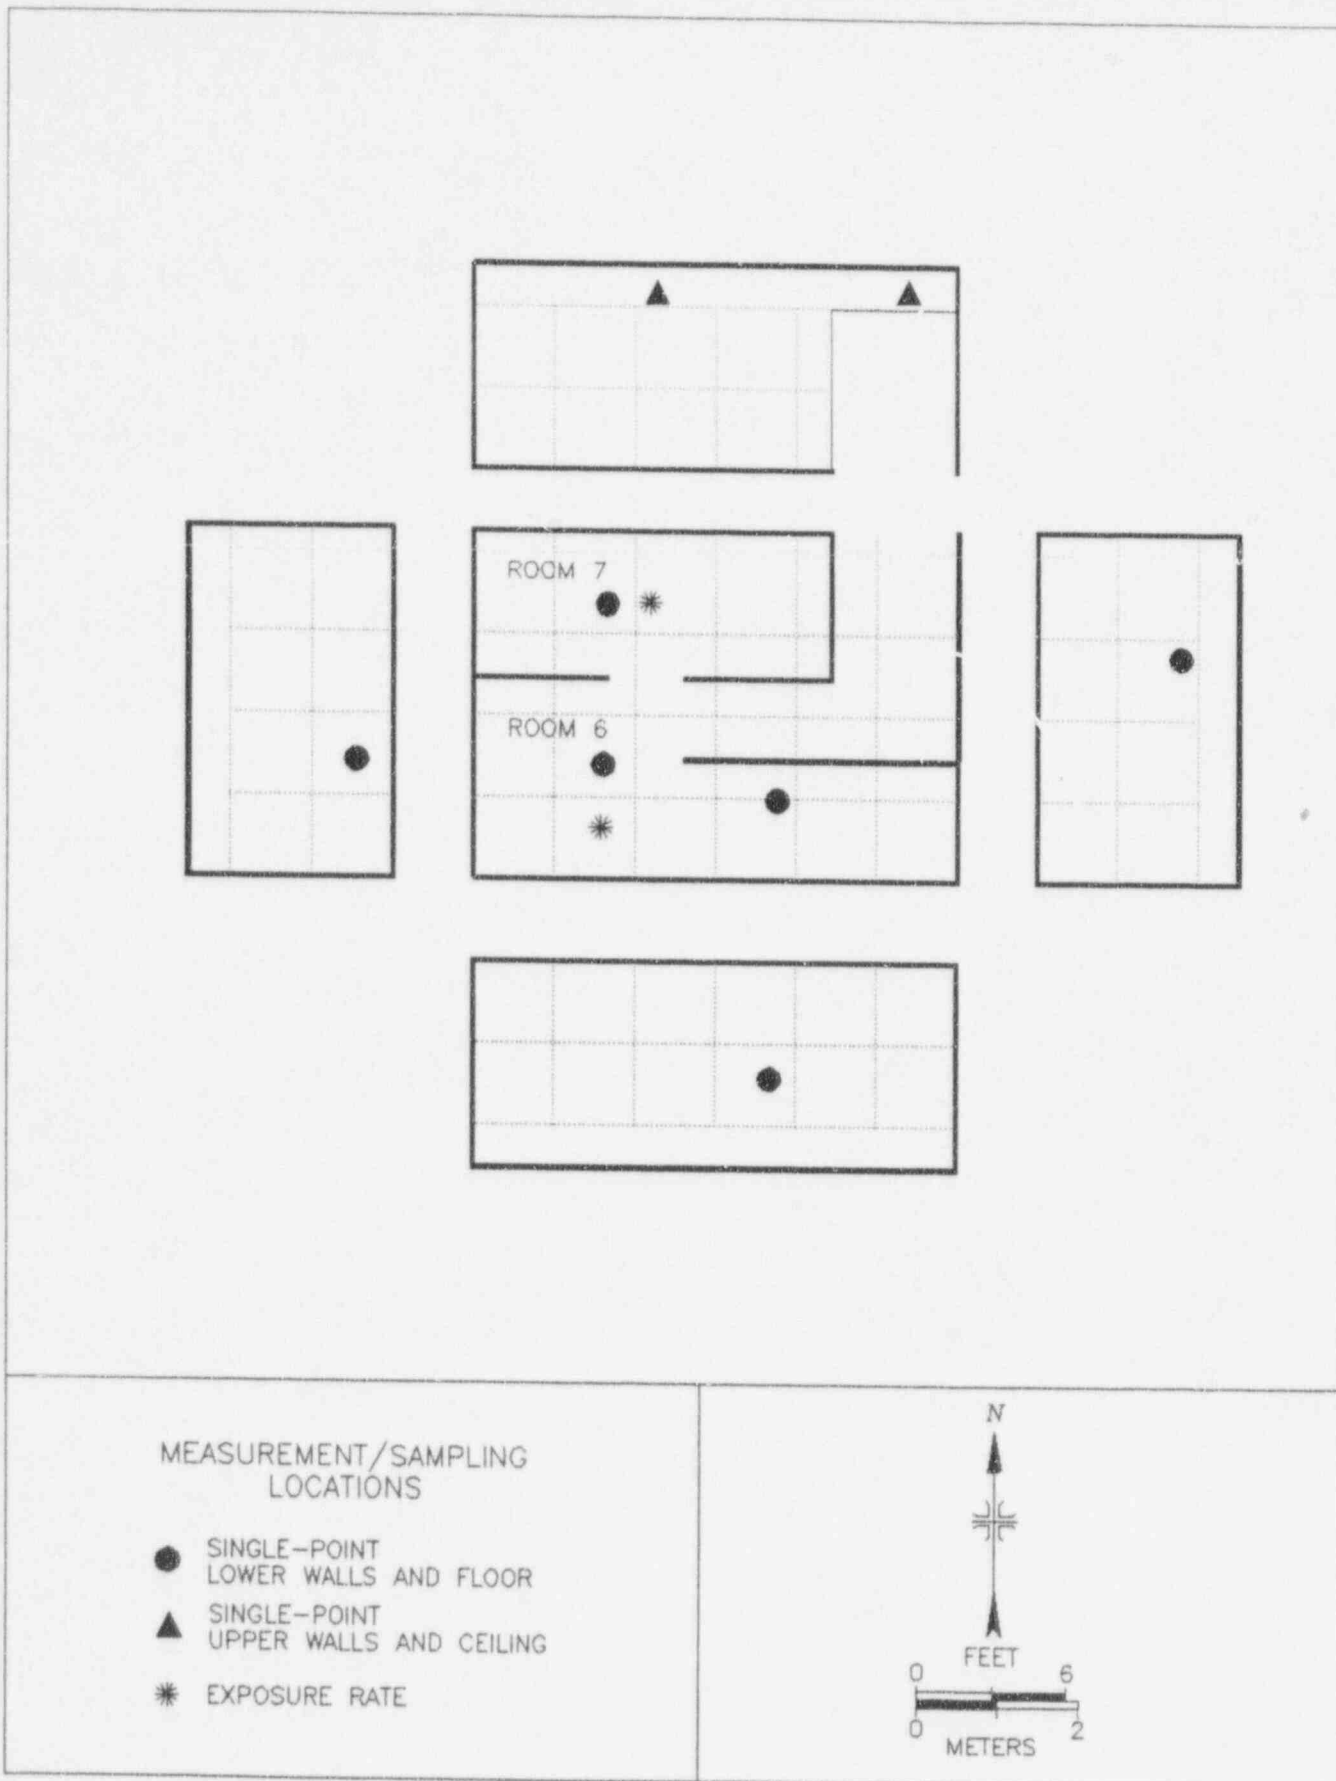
Building 1, Rooms 6 & 7 - Measurement and Sampling Locations
